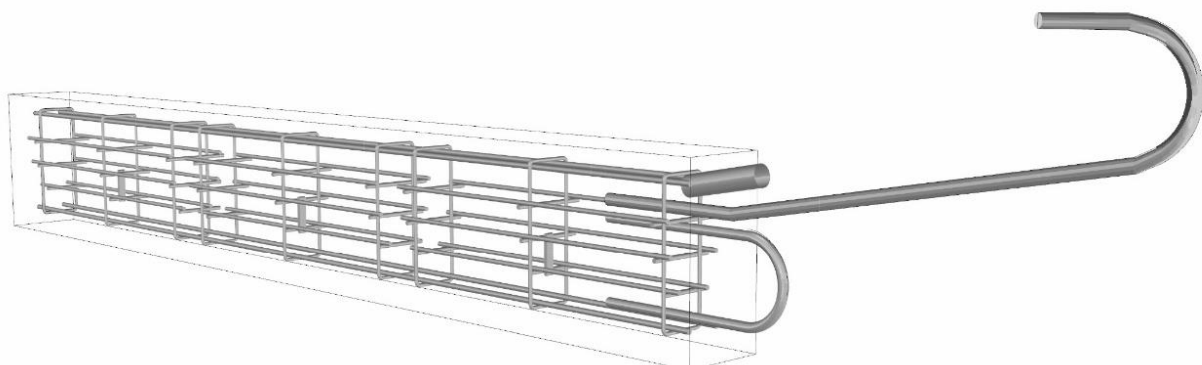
3D drawing of the instrumented concrete element including reinforcement, inserts and sensors.
